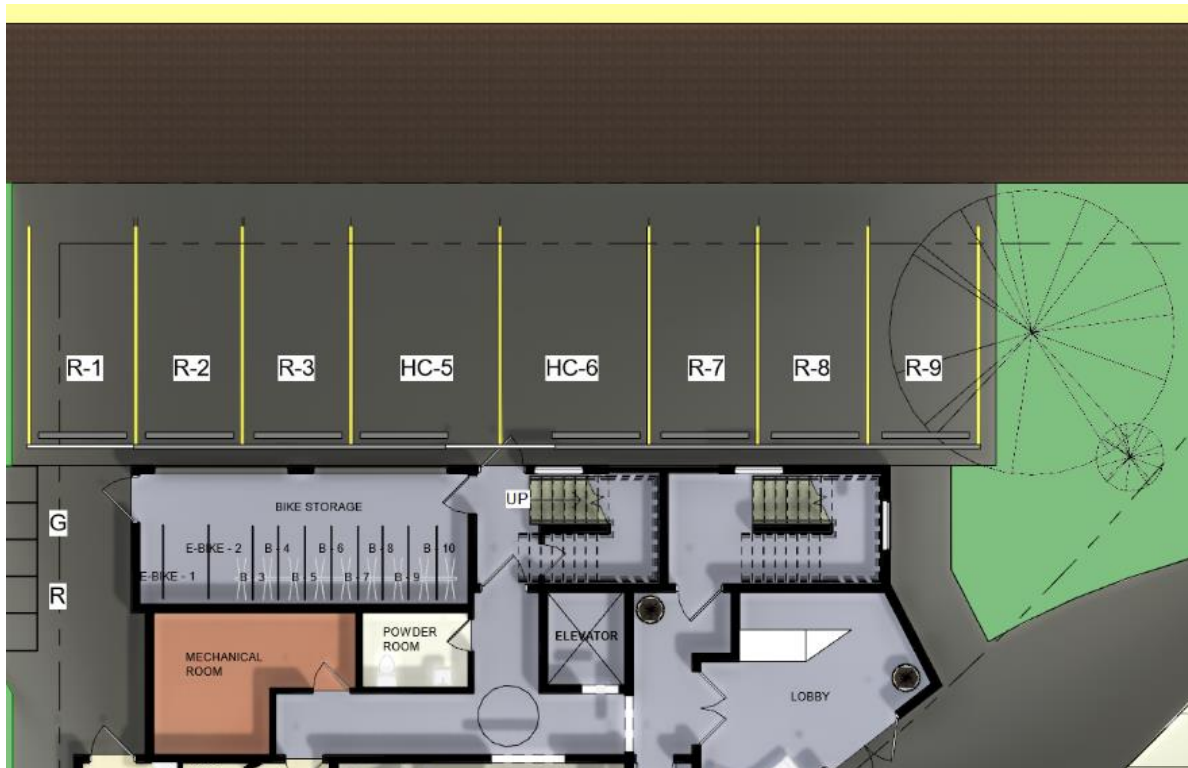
Floor Plan 1 - Proposed Yew Park Building Parking
